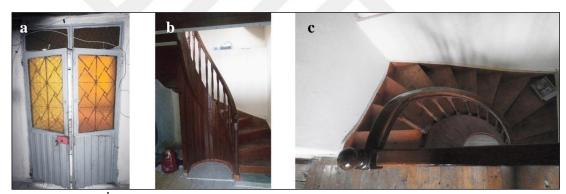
İrfan Kozan House ground floor a. House entrance door (View C); b.,c. Stairs (View J)(S.Sevimbige archive, 2017)
